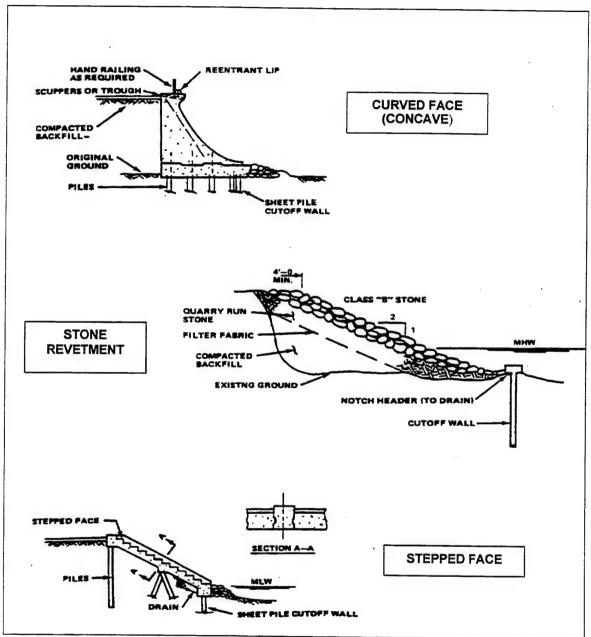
Curved Face, Stone Revetment, and Stepped Face seawall configurations.
